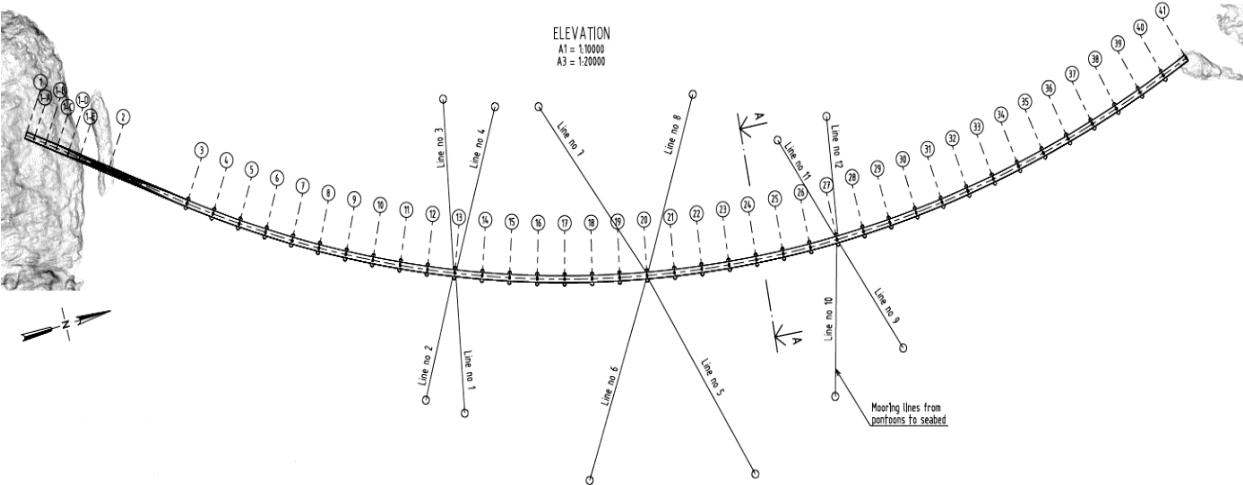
Plan view of Bjørnafjorden bridge - concept K12 [11]
